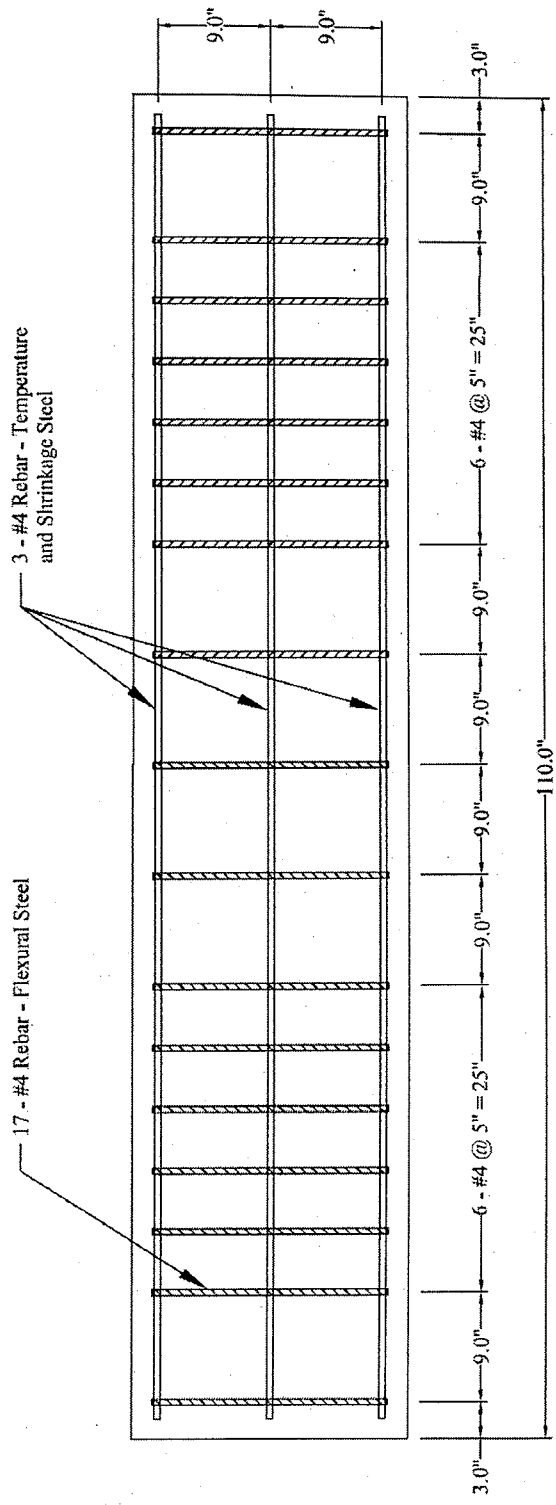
Plan View of Slab Reinforcement of Phase 2 Test Specimen
